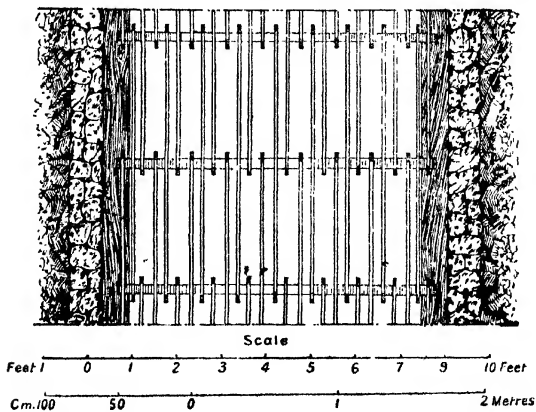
Plan showing the small rods stretching from beam to beam.
